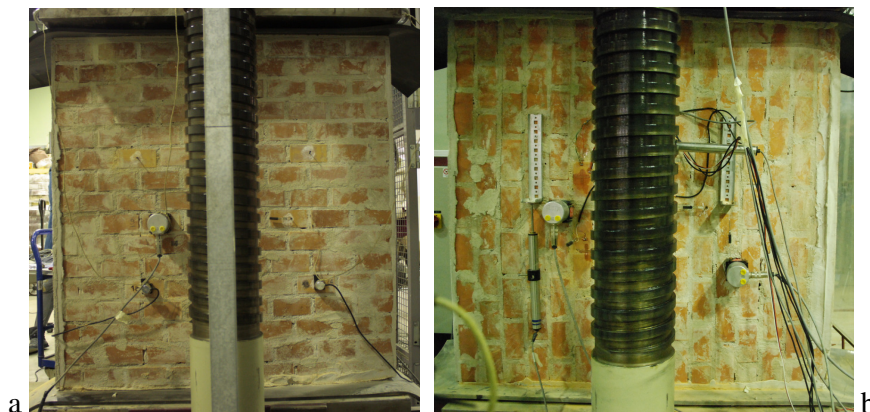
Compressive tests on masonry panels. Laboratory test configuration for compression normal to bed joints (a) and parallel to bed joints (b).
